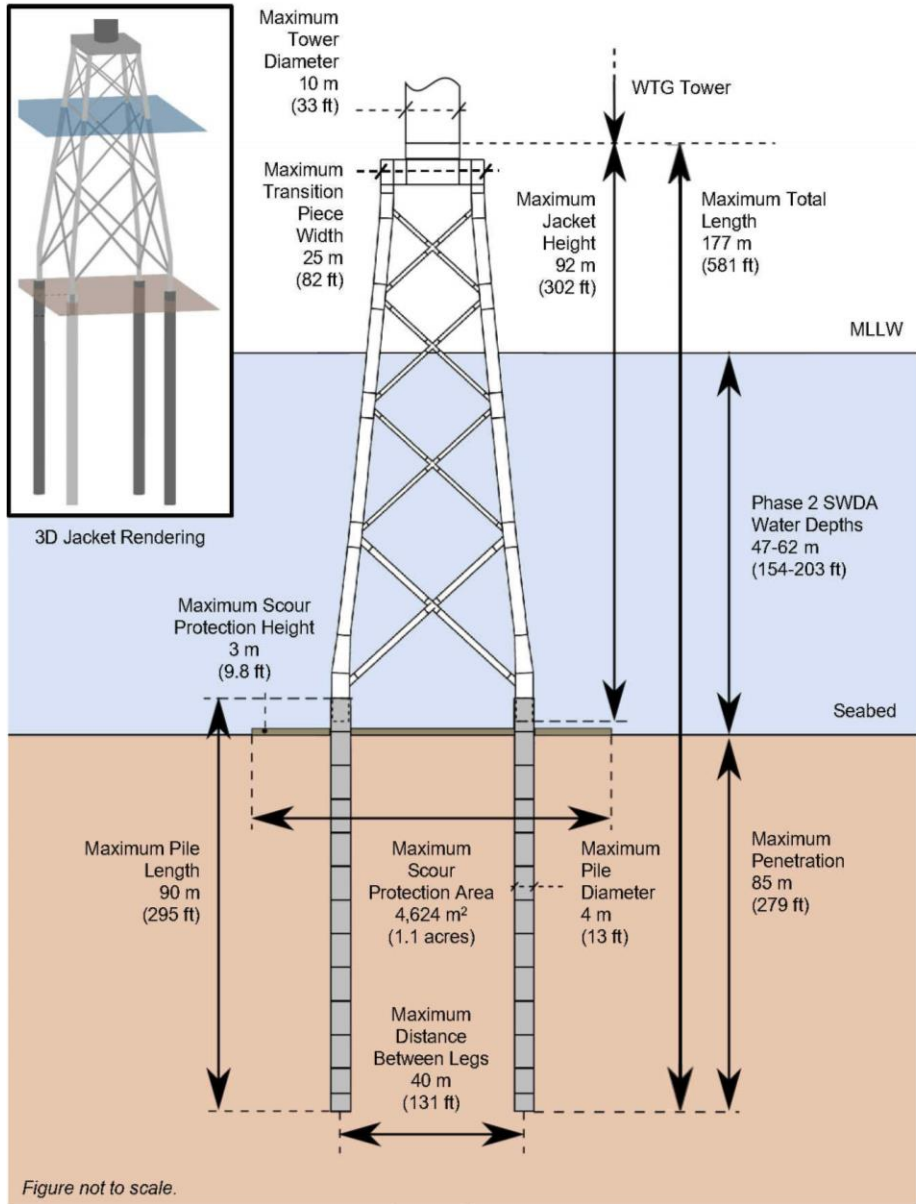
Schematic drawing of a jacket foundation (Figure 4.2-3 of the New England Wind Draft Construction and Operations plan Volume 1, Epsilon 2021).
